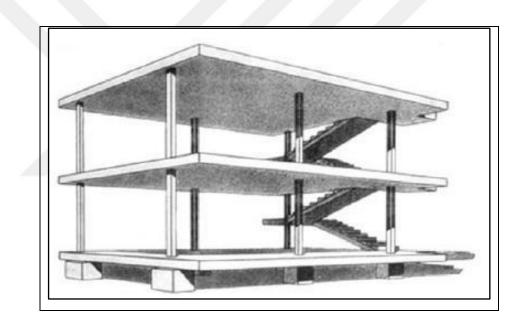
Concept of construction in concrete consisting of a frame poles bearing the floors and for any foundation, laying on simple "dice"; the frame can freely compose the facades and plans, designed by Le Corbusier, Maison Dom-Ino, 1914 [67]
